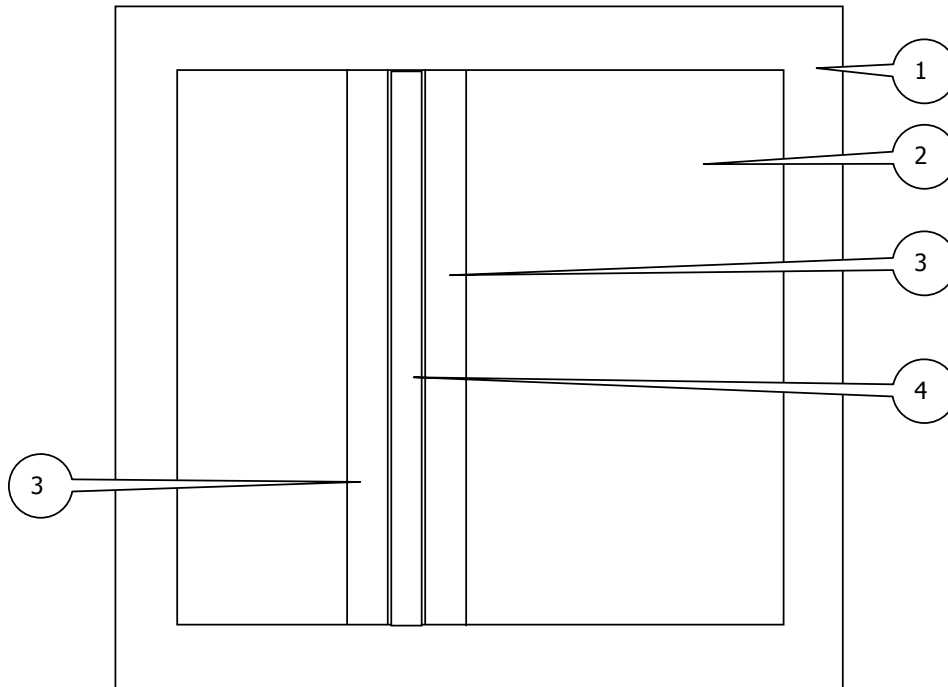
test configuration for vertically oriented cavity barriers within walls (elevation)
